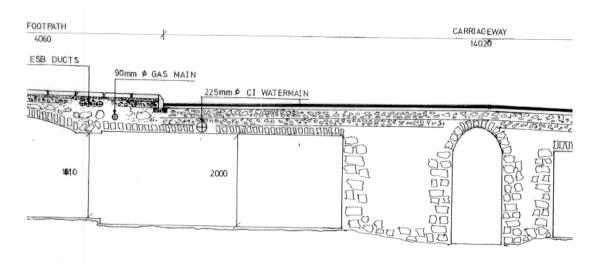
Cross section showing a typical basement, walking culvert and services in O'Connell Street Limerick (Arup survey of basements and culverts 1987)
